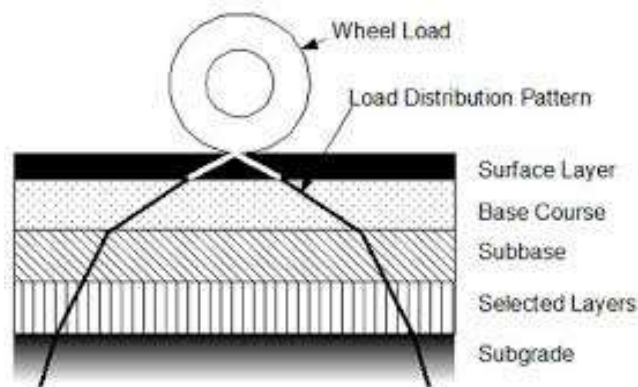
Load distribution of flexible pavement (SANRAL, 2019)
